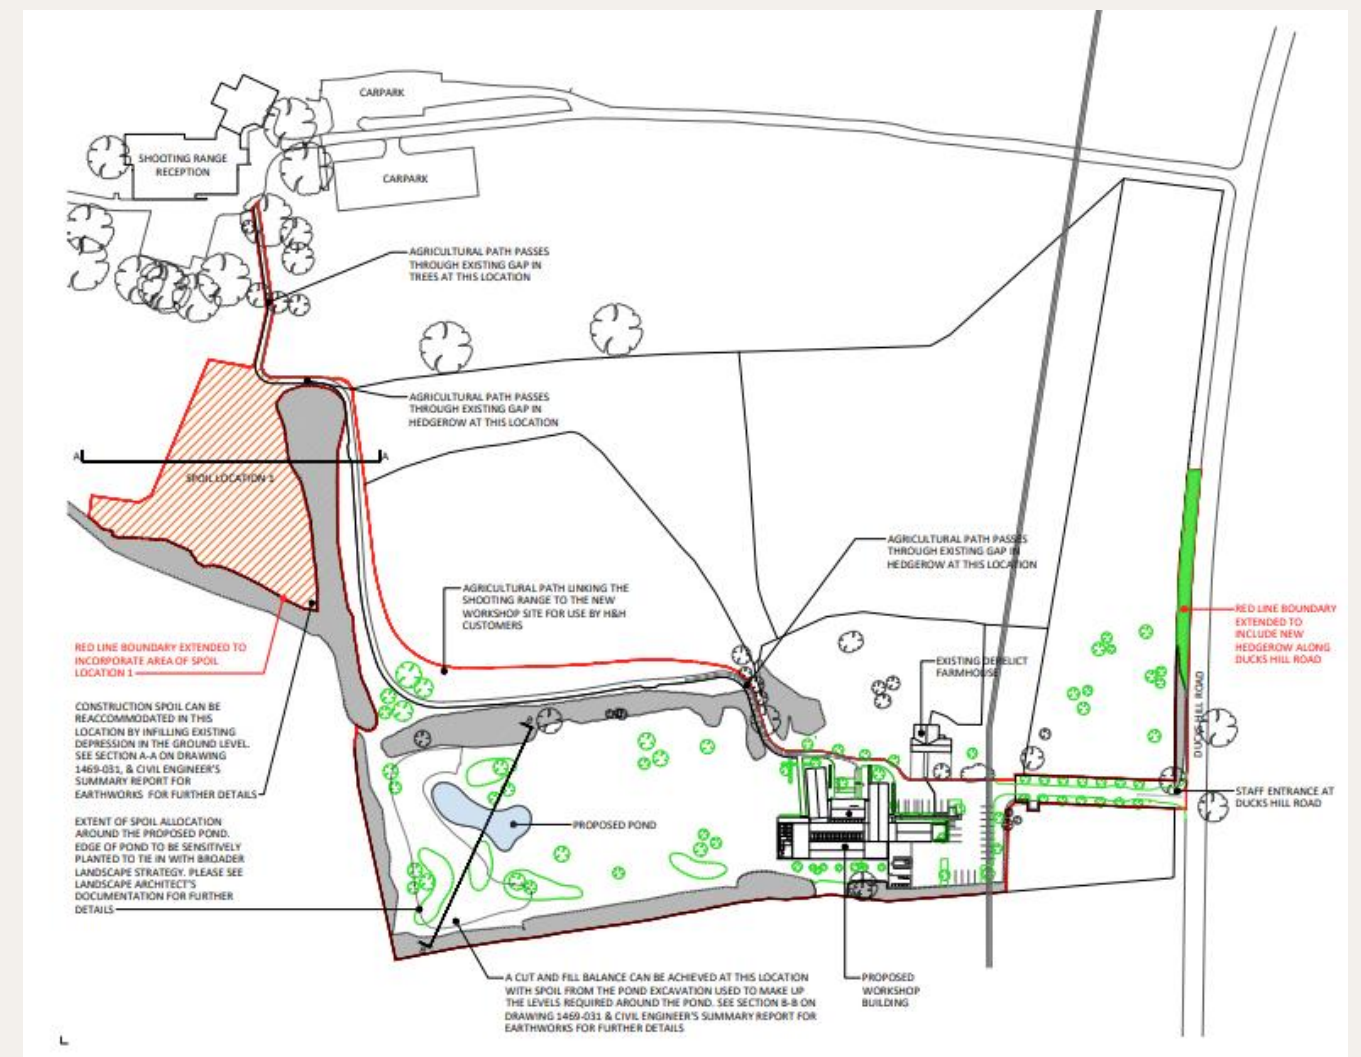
Proposed Site Layout with Planting View (Source: McDonald Architects)
